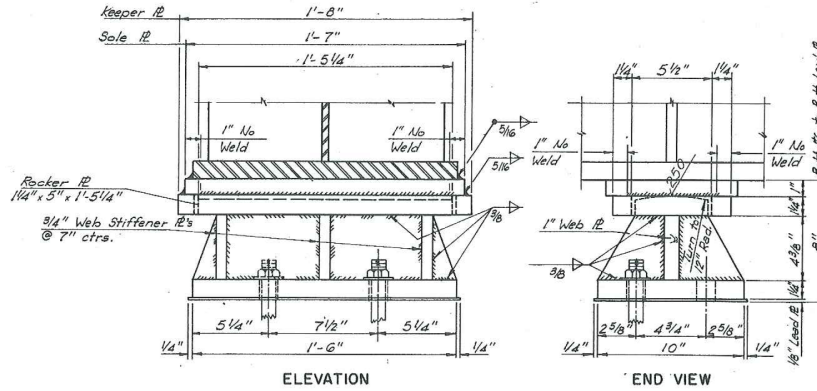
High-type steel bearing details. Taken from Proj. No. I-FI-35-4(97)166 plans.
